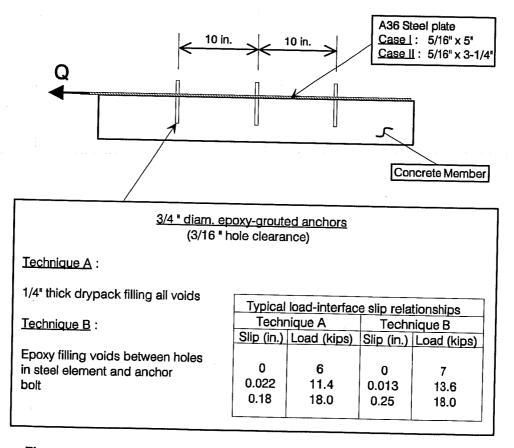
Details of sample multiple-anchor steel-to-concrete connection
